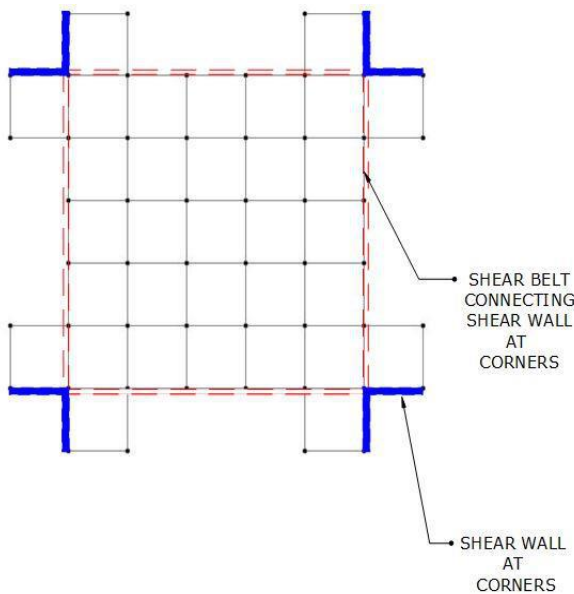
Structure with shear strip connected with Shear Wall at Corners
